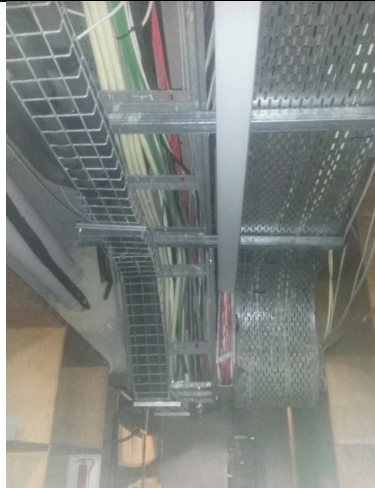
Basement looking onto Passage3 doorway with Sub DB against the back wall - Cable trays with electrical and mechanical
